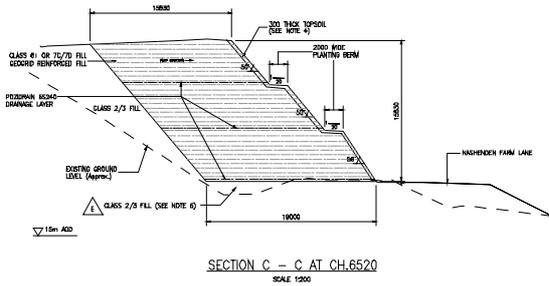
Section of Reinforced Slope S16 – Borstal Court
